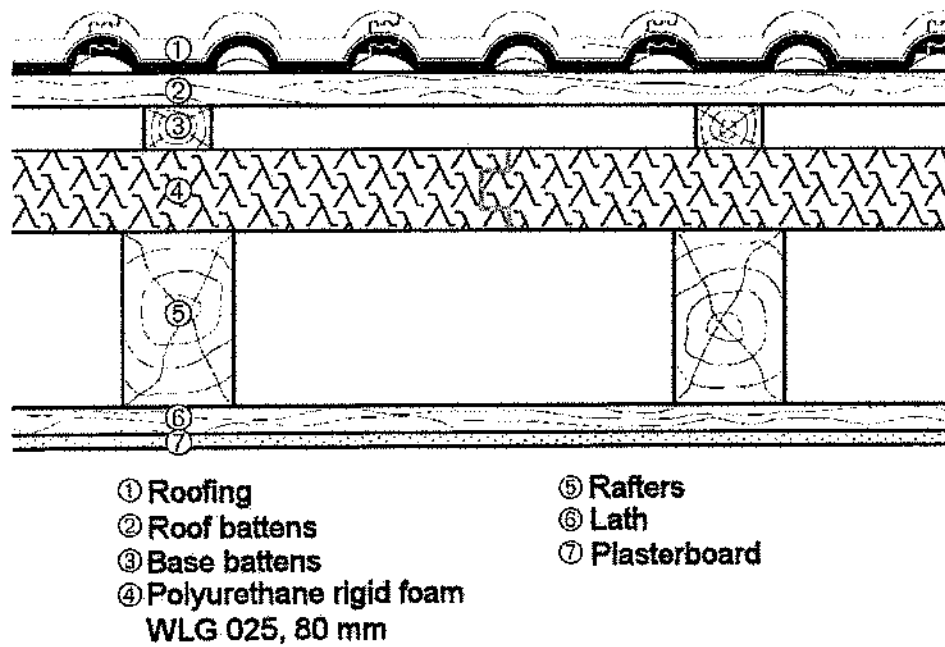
Polyurethane pitched roof insulation with plasterboard below the rafters
